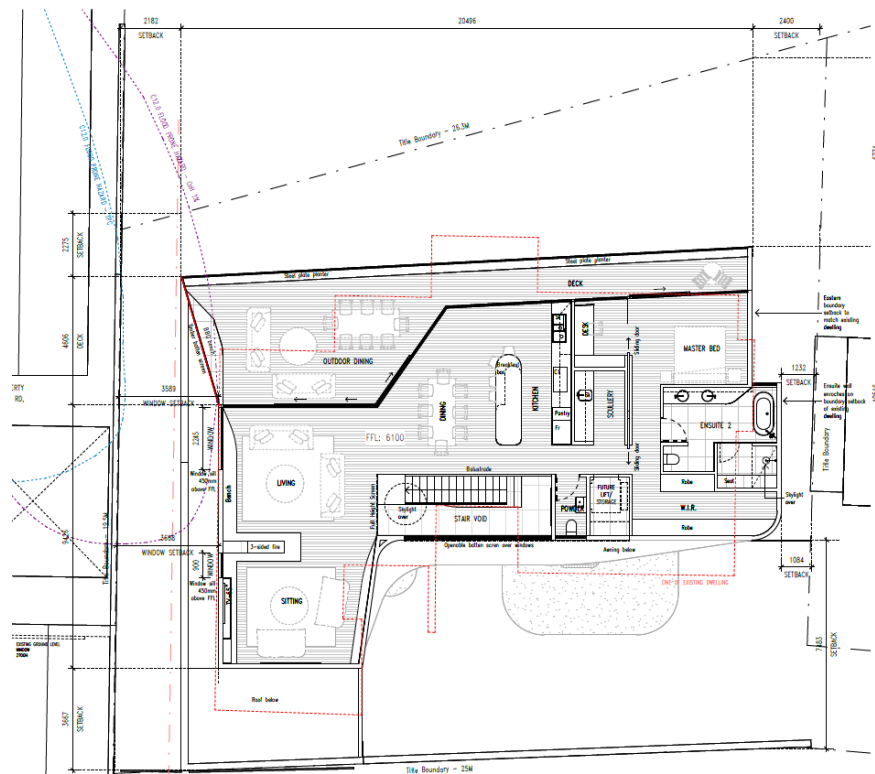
Site plan showing the existing building siting with the red outline (source: Preston Lane)
